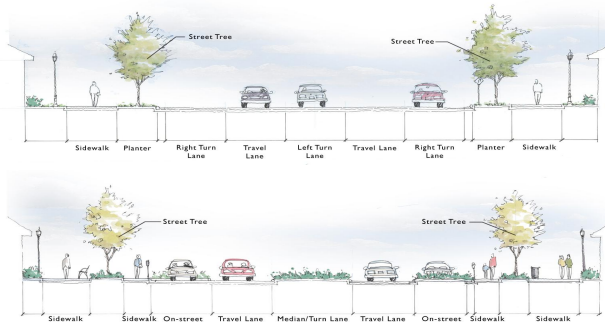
Crabapple Road Cross Sections (Existing/Proposed)
